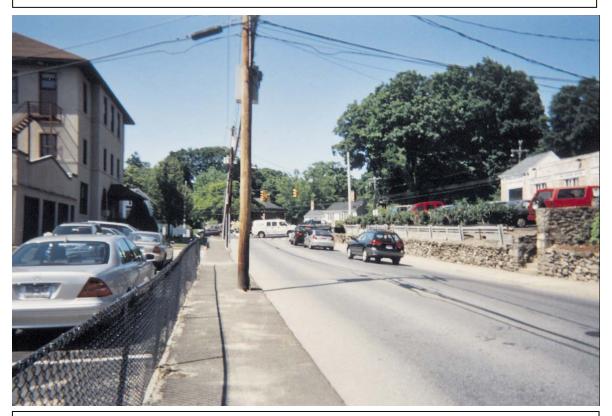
Imperial Avenue looking northbound south of Route 1 (Post Road West).
